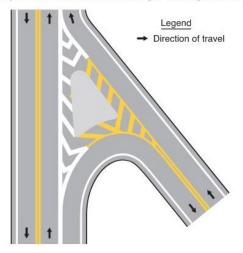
J-5. Example of Pavement Markings Contiguous to a Raised Island
